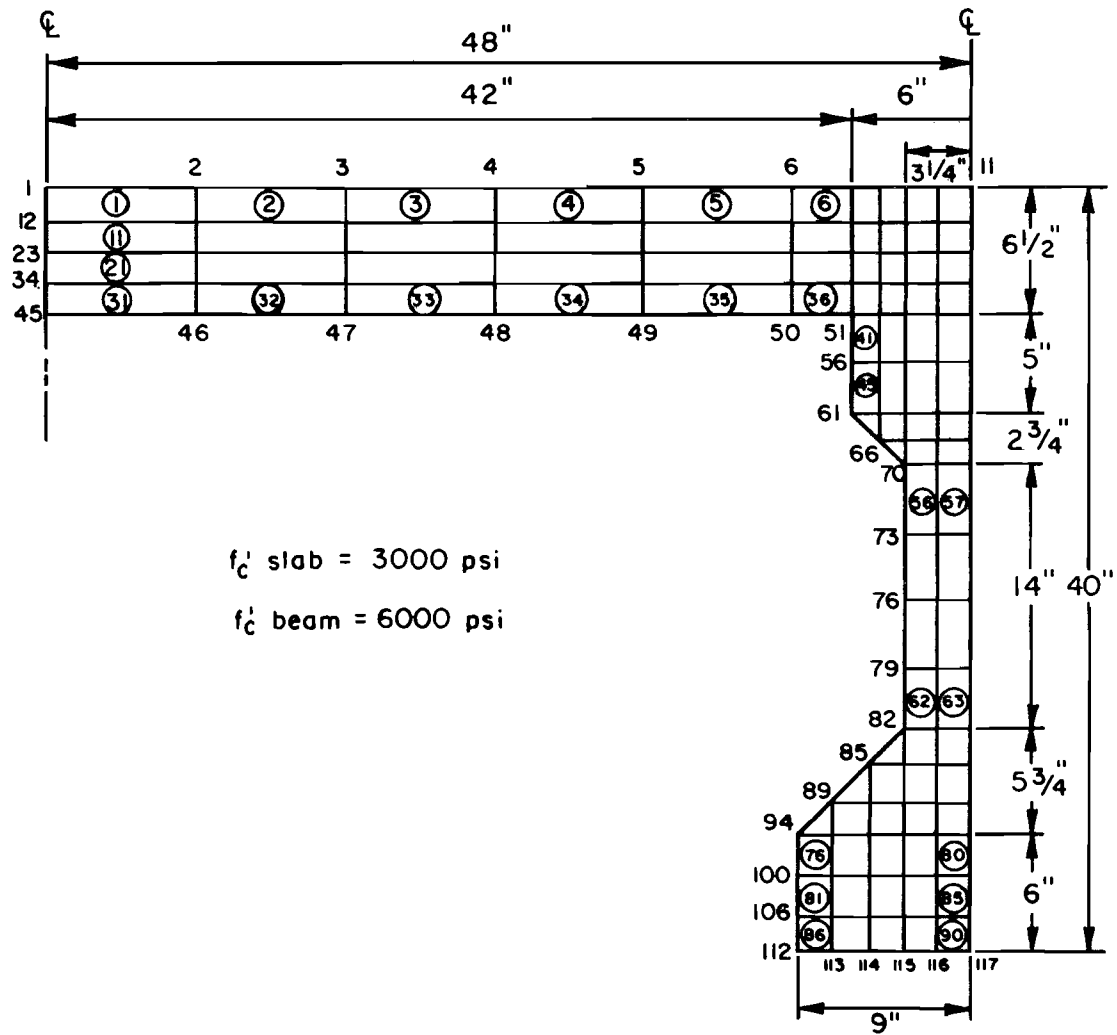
Typical interior girder idealization of a composite precast pretensioned bridge (Texas standard type B-beam).
